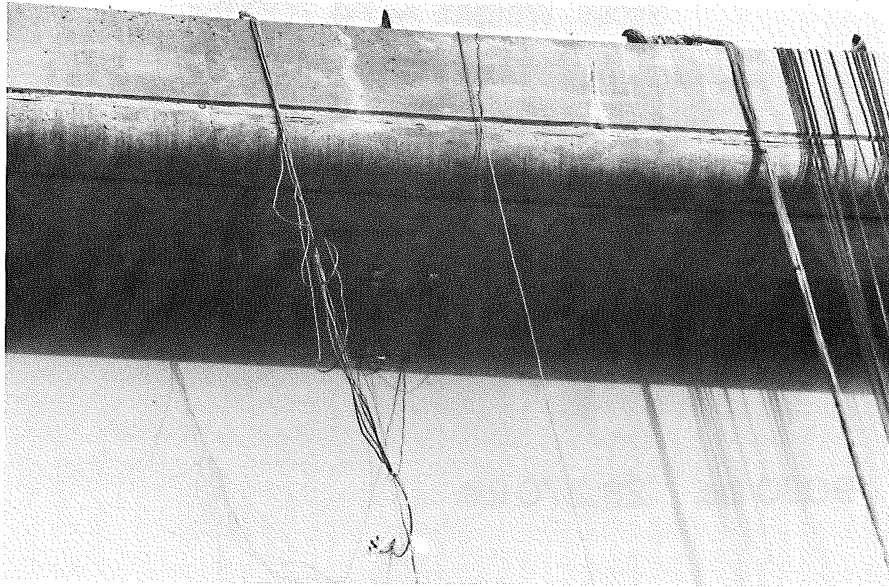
Strain Gages and Wiring, Girder G8 near Pier 7
